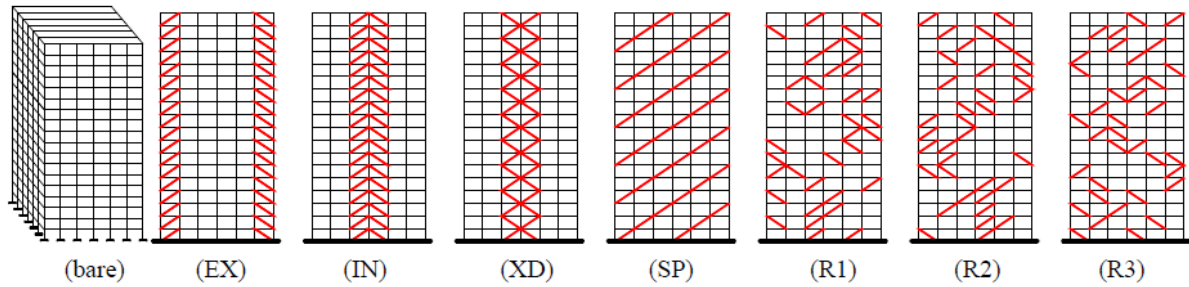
Tested Bracing Arrangements of the Perimeter Concrete Frame (Mezzi 2010)
